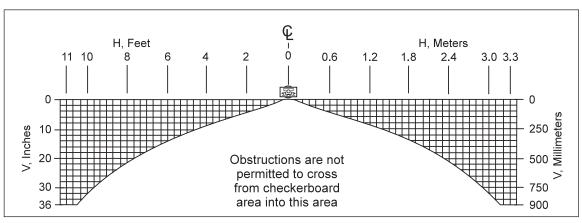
Obstruction area to umbrella pattern along the mounting wall of sidewall Nonstorage sprinklers on standard spacing
